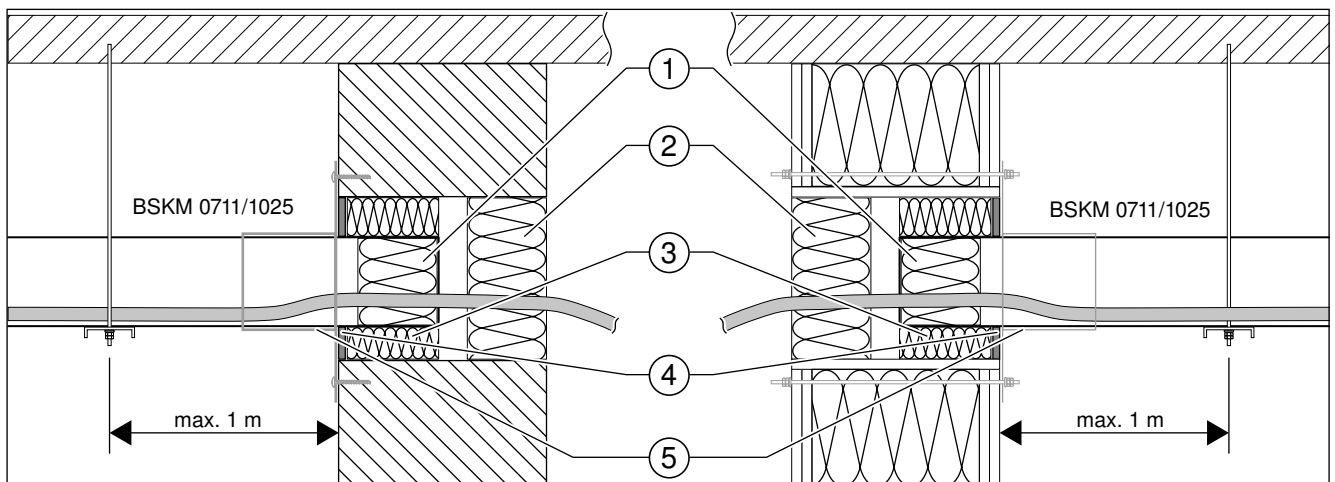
Wall end cover within the wall for BSKM 0711 and BSKM 1025
